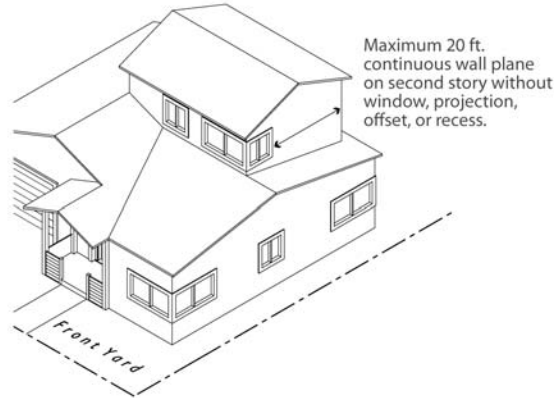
J.3: TWO-STORY DWELLING ON CORNER
